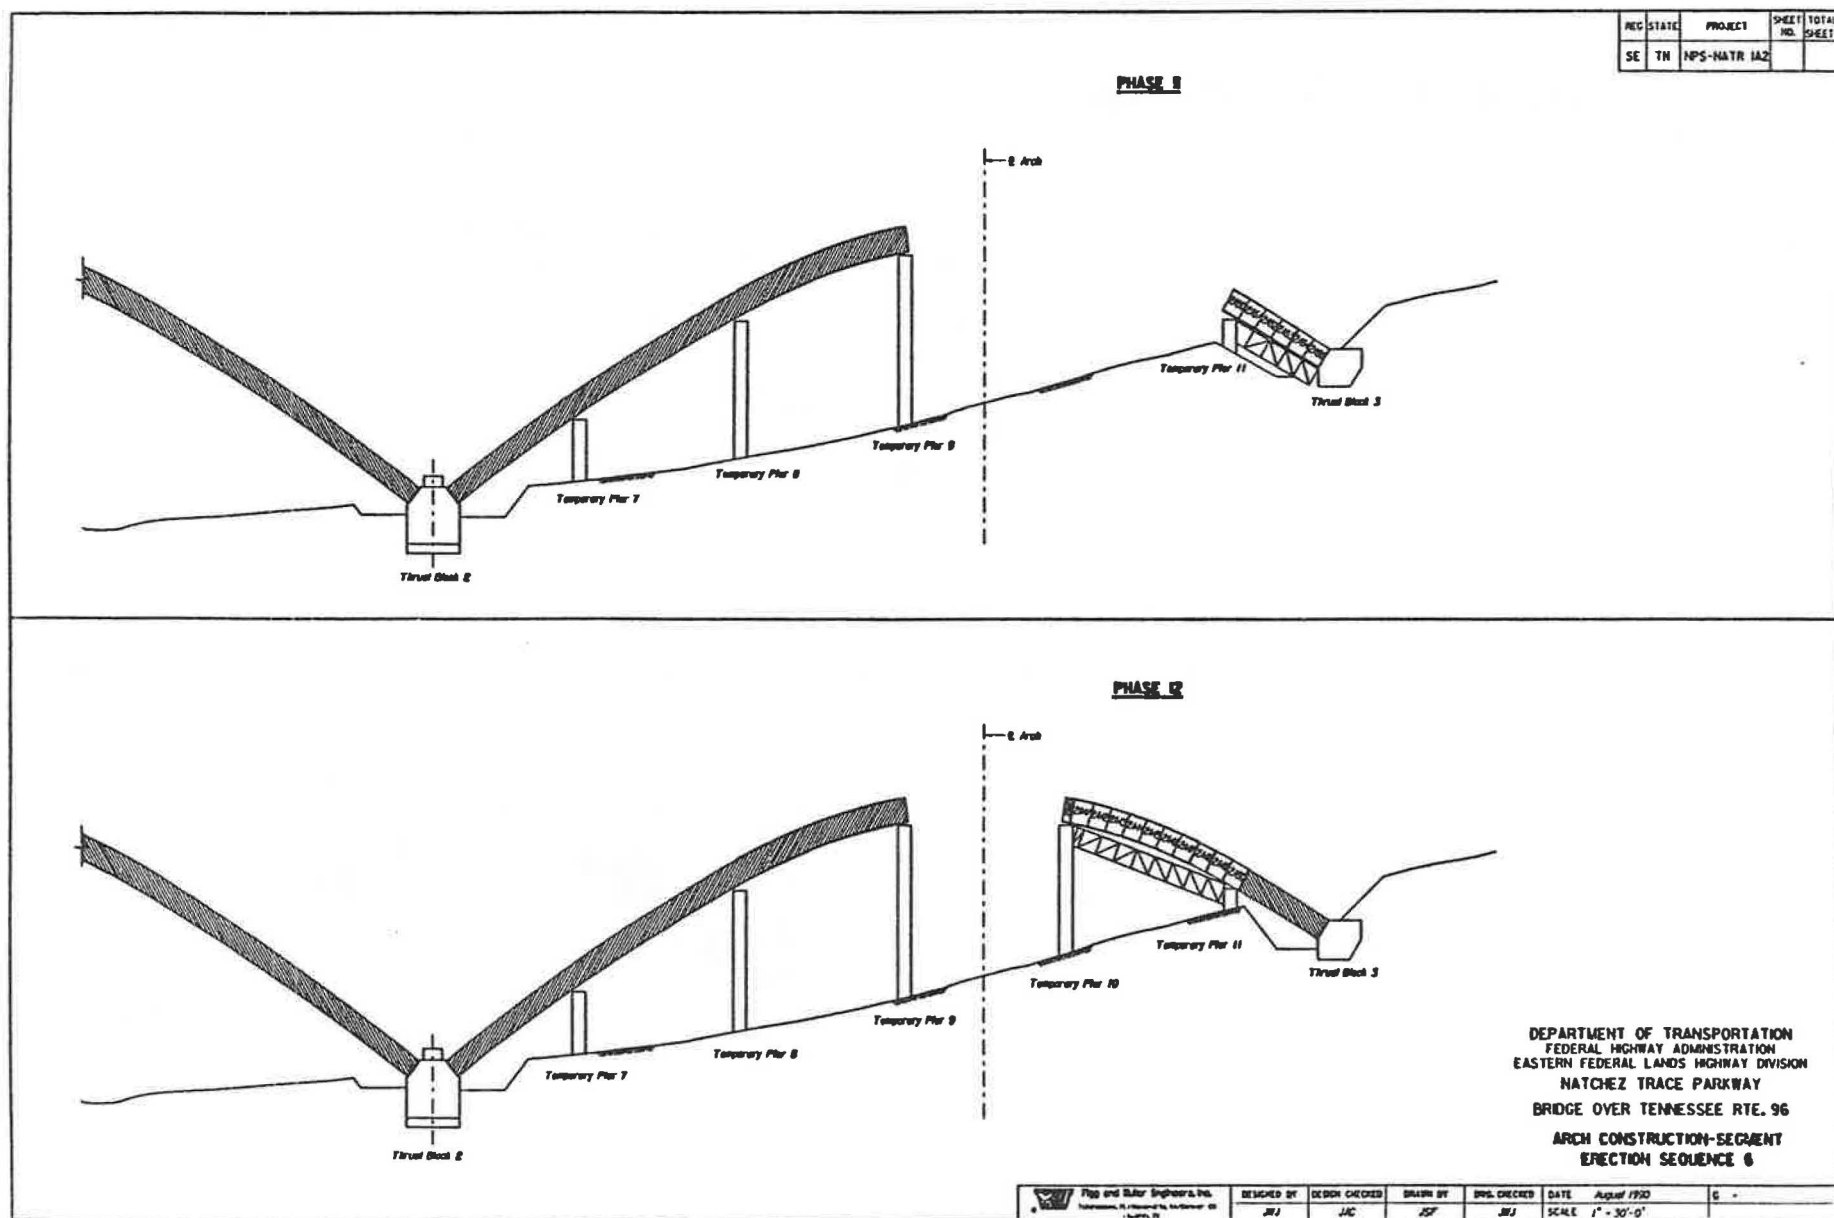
Arch construction - precast alternate - phases 11 and 12
